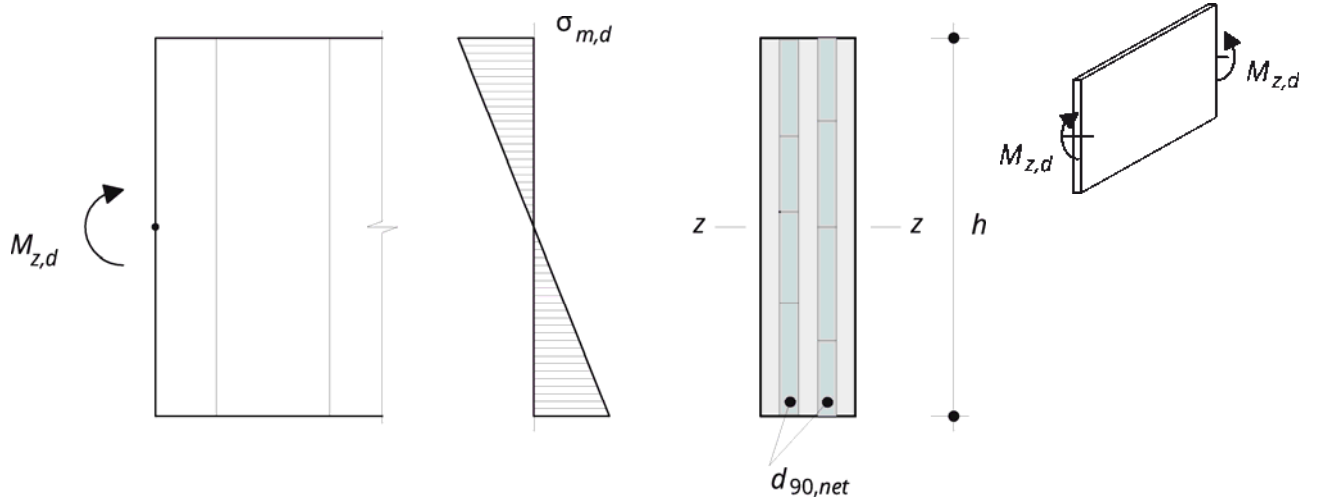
Bending stress for girders with a top layer transverse to the direction of load-bearing capacity
